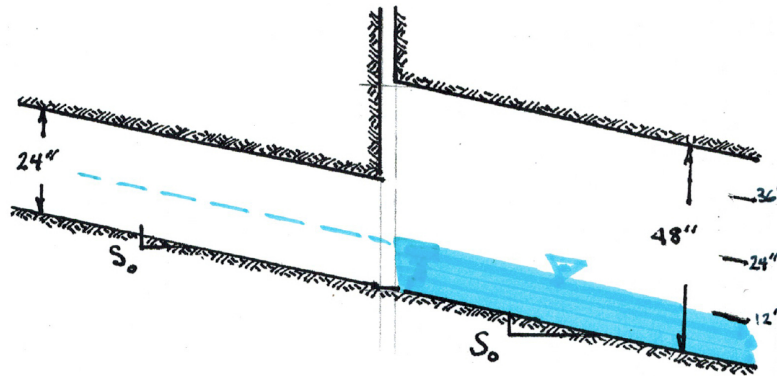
Sewer pipes connected at a junction box. Matching flow line elevations.
